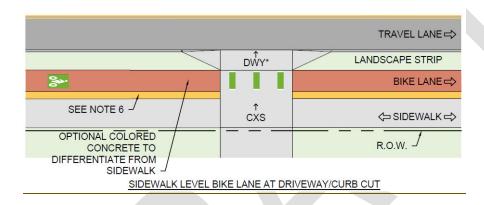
Typical Layout for Sidewalk Level One-way Separated Bike Lanes at Driveways
